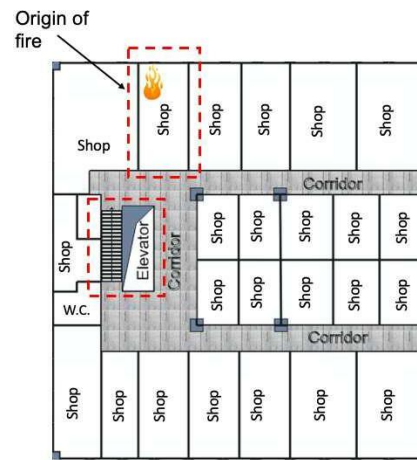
Typical floor plan of upper floors in the Plasco Building (Govt. of Iran (2017))
